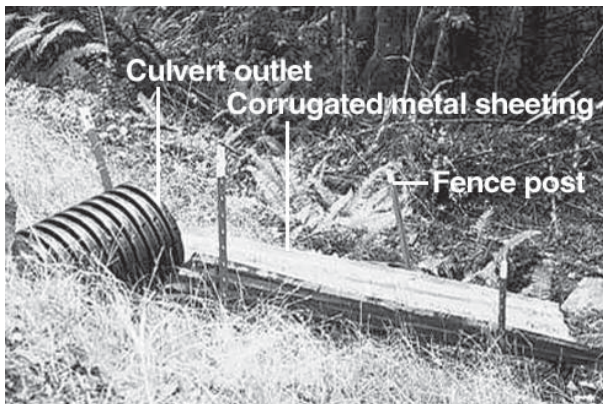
A ditch relief culvert with a downspout of corrugated metal roof sheeting.
